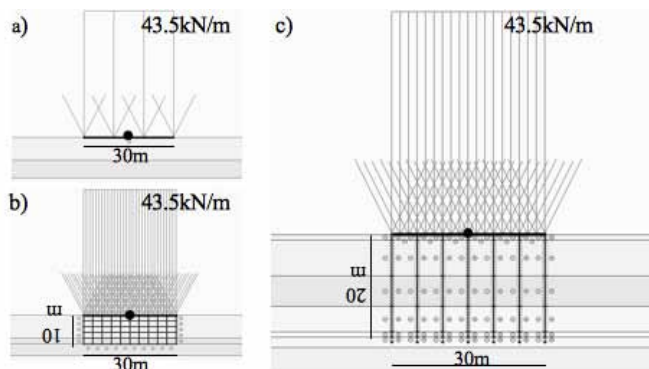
Foundation layouts: a) shallow foundation; b) deep basement; c) piled foundation
